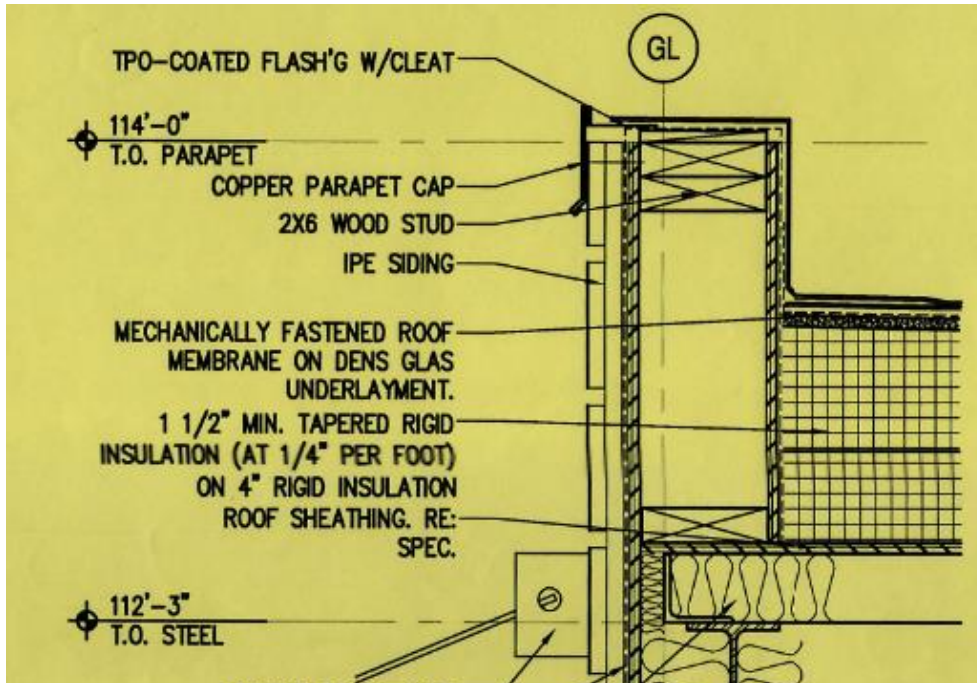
Original CDs, Detail 1, Sheet 9.2, Section through TPO roof system
